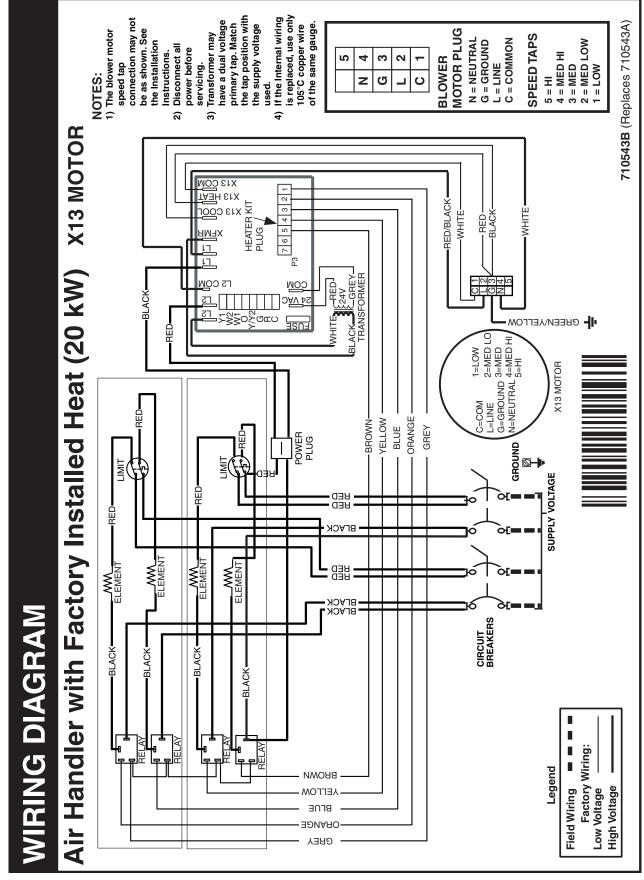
Wiring Diagram for B5BV Series Electric furnace Equipped With X13 Motor & 20 kw Heater Kit
